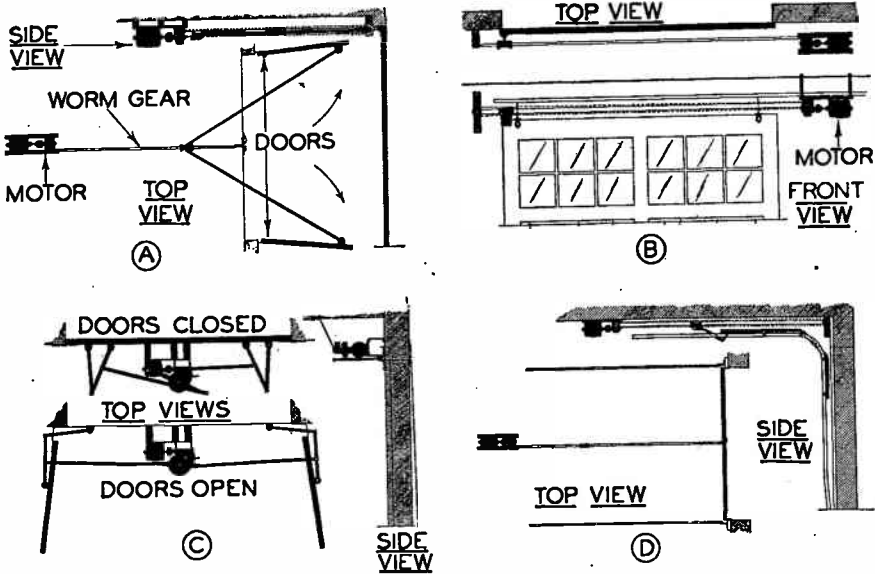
Types of electric door-operating mechanisms. A—top and side views of motor-driven worm gear mechanism for opening outward-swinging double doors; B—motor-driven endless cable for opening single-section sliding door; C—motor-driven crank and link mechanism for opening inward-swinging double doors; D—motor-driven endless cable type opener for overhead doors.
